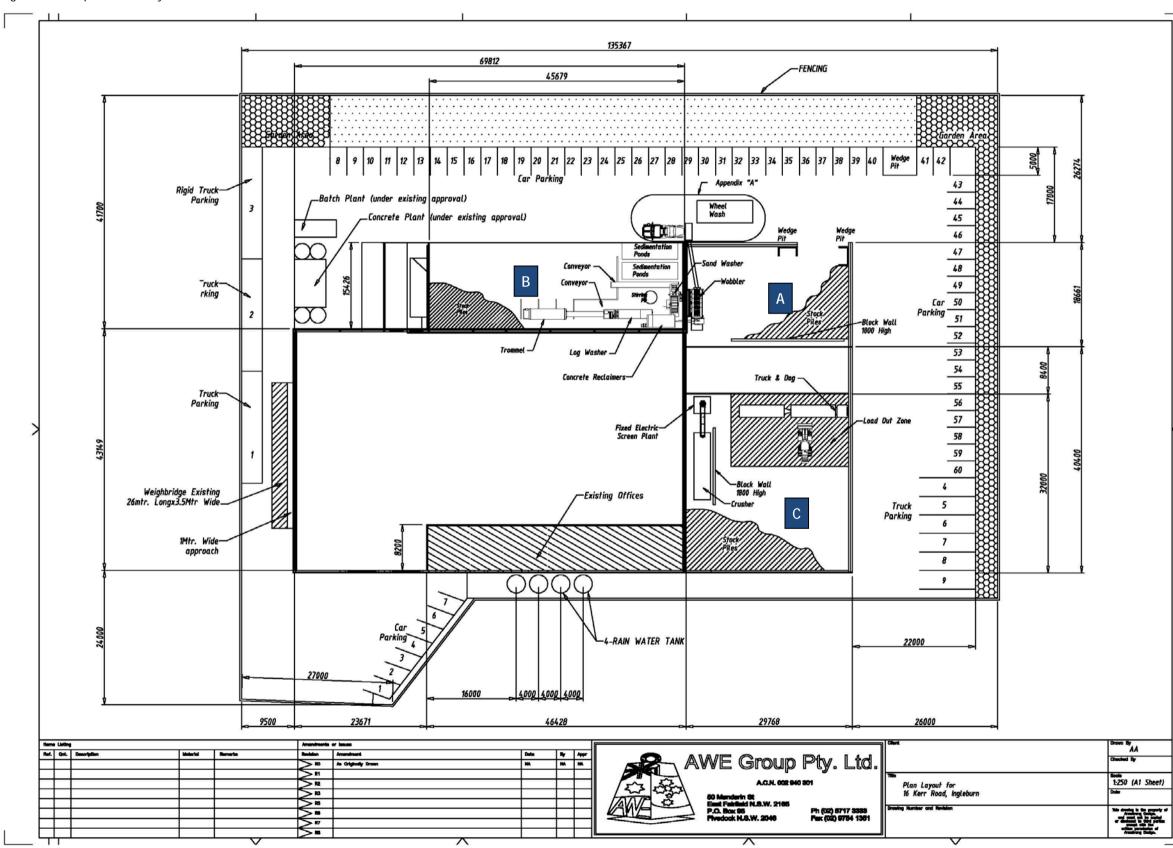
is a plant layout. It shows the foot print of the building and the main activities on the site in Areas A, B and C.
